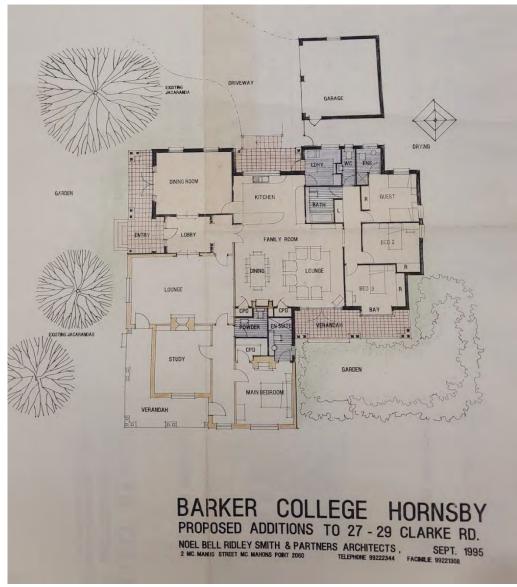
Plan for 'Proposed Additions to 27-29 Clarke Road', Barker College, Hornsby, prepared by Robert Staas from Noel Bell Ridley Smith & Partners, architects, dated September 1995. (Source: Barker College Archives, Plan M2015)
